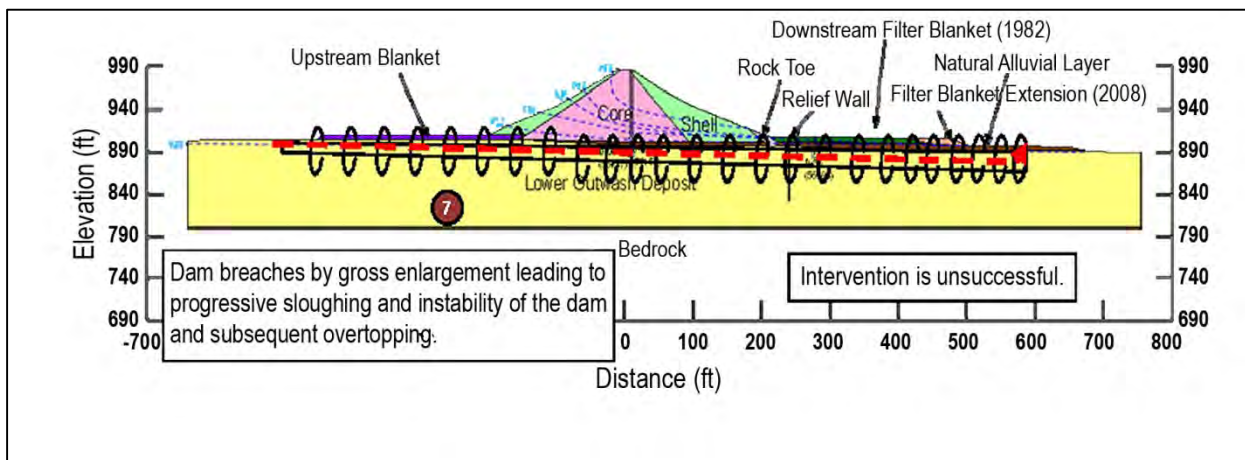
Example PFM: Stage 7 of a “through foundation” failure mode.
